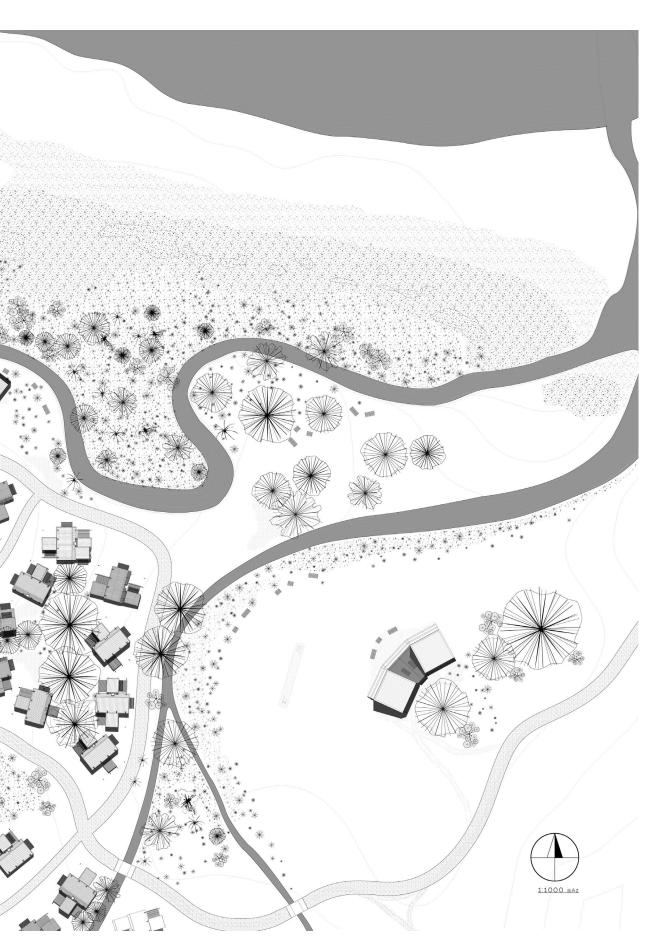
Final site plan. Vector artowork. Author's Own (2020).
